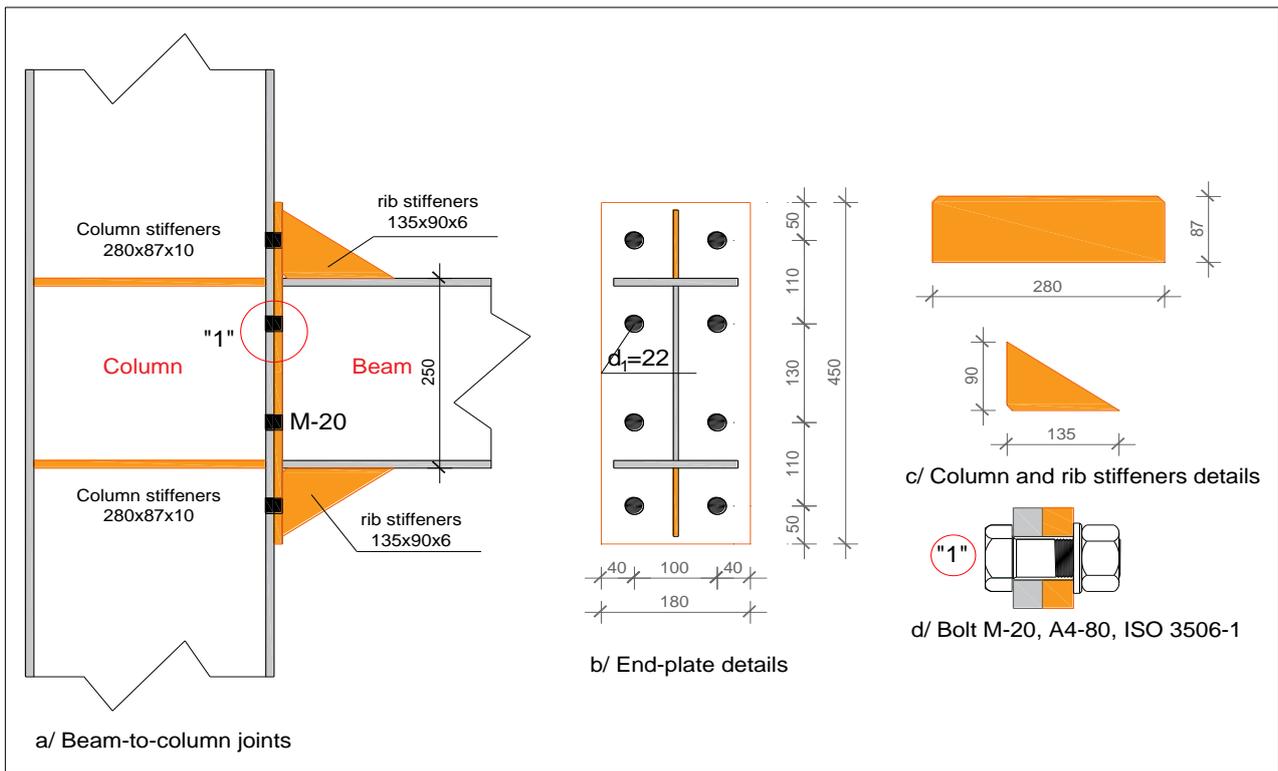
Geometric details of the joint specimens (all dimensions in mm), Gao et.al (2020) [17]
